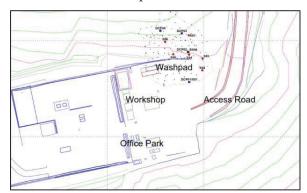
Proposed Plan DCP Test & Sondir Test of Washpad AEL Magazine at Bengalon.
